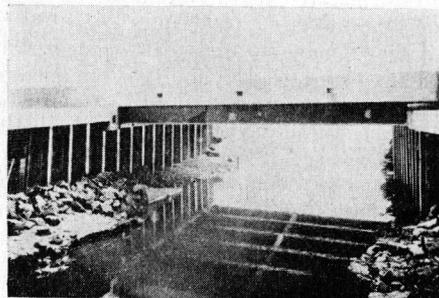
Steel H Piles Bracing Sheeting. Courtesy of Carnegie Illinois Steel Corp.
